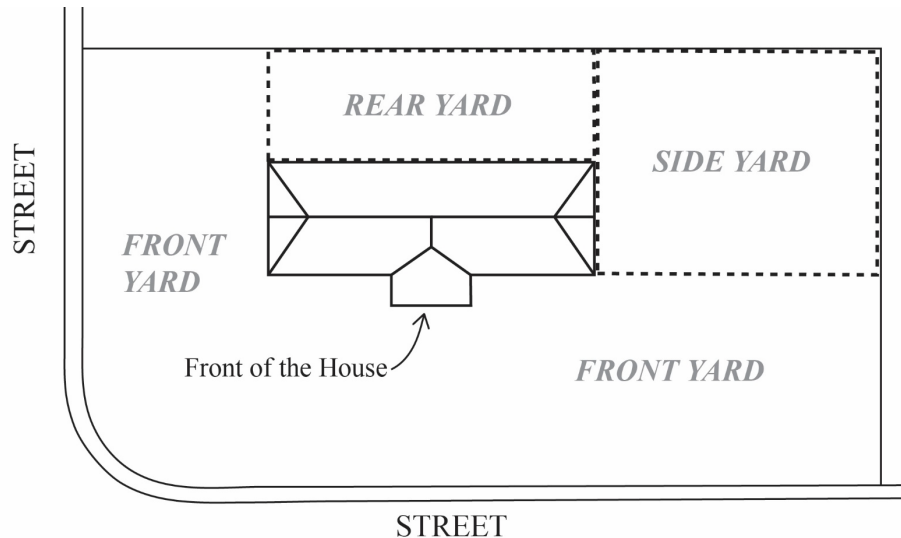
Corner Lot Yard Illustration Exemption with Front Door Facing the Larger Lot Width
